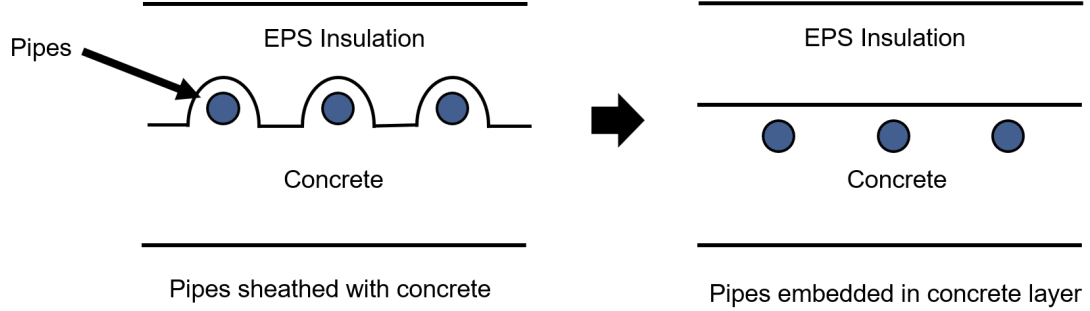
Side view of simplification process of pipe adjacent layers in floor TABS.
